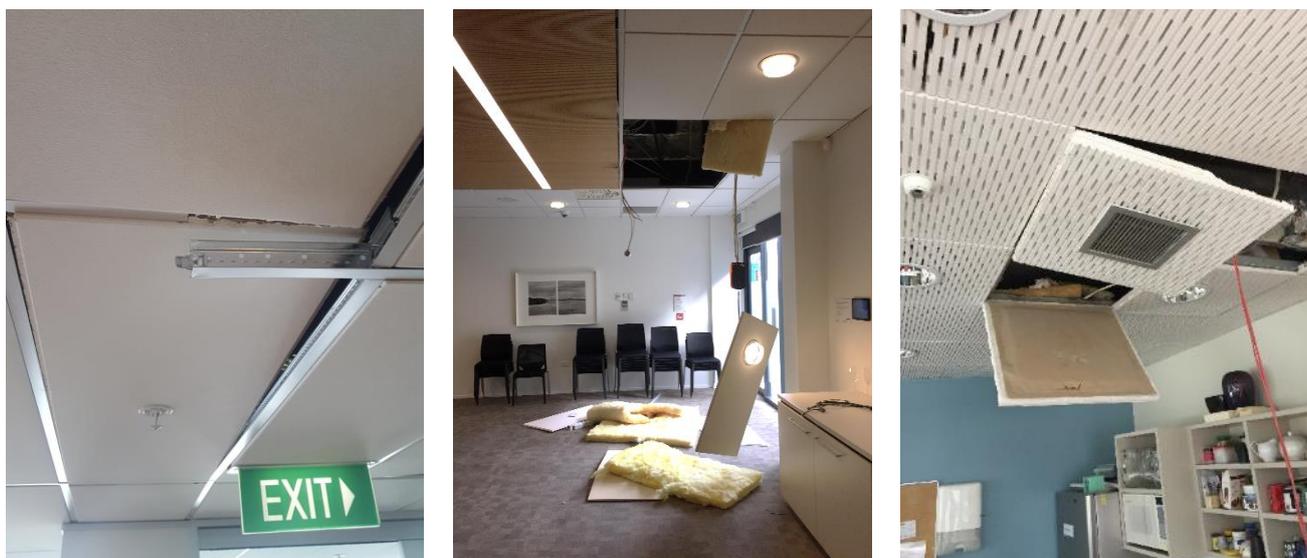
Damage to suspended ceilings: failed ceiling t-rail (left), fallen lightweight ceiling tiles (centre), fallen heavy plaster tiles (right).
